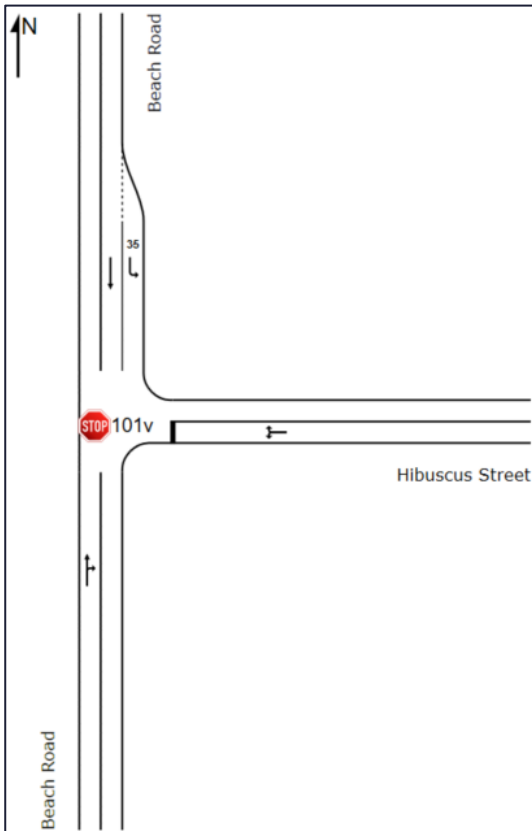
Existing Intersection Layout: Beach Road & Hibiscus Street
